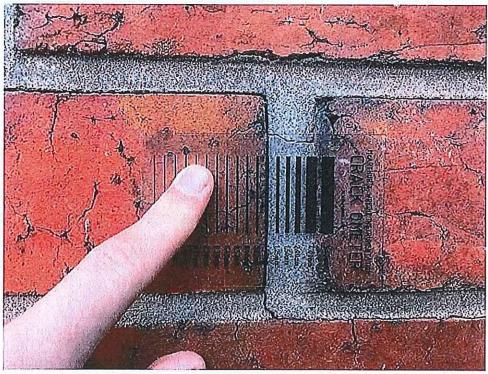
Example of 'fresh' cracking to south east (front) wall, note location in Appendix B - crack width noted as 1.0 mm.
